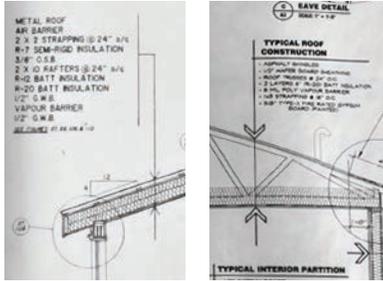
Cathedral Ceiling Construction (left) Insulated Attic Construction(right)
